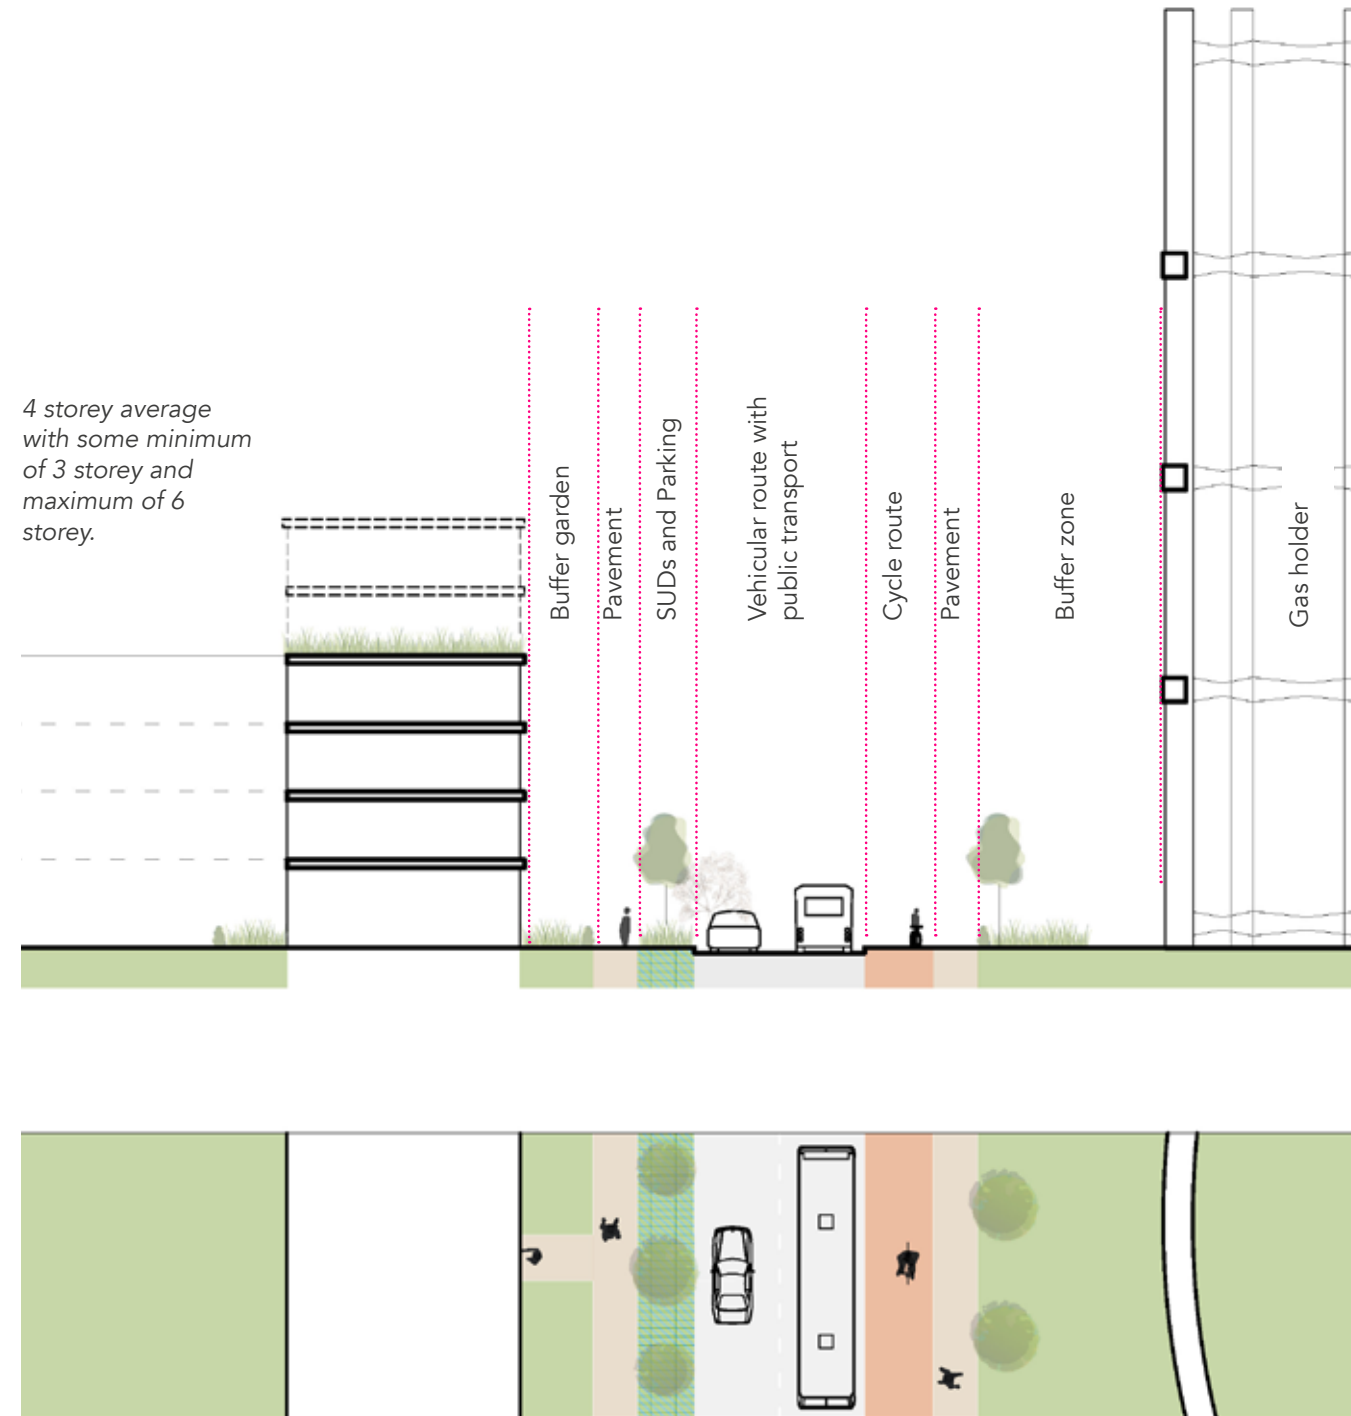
Illustrative section and plan for residential street (shown here within Upper Granton)
